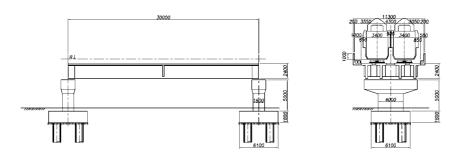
Typical Cross Section of Girder Viaduct
